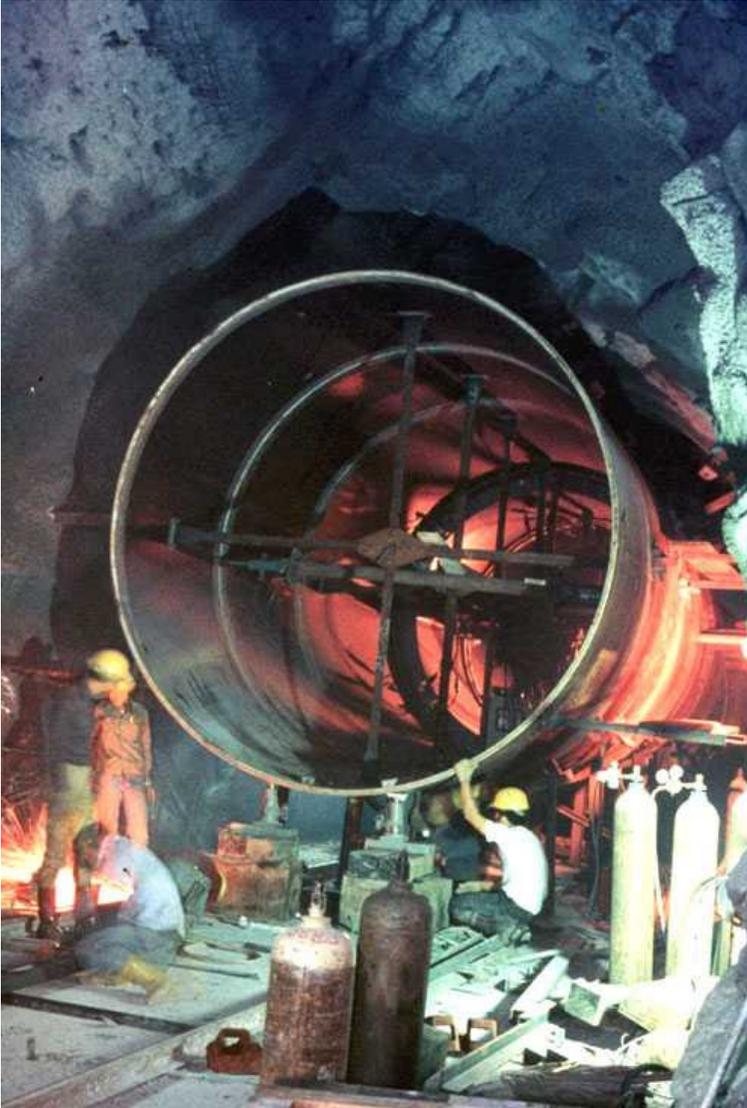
Installation of steel lining in a pressure tunnel in a hydroelectric project.
